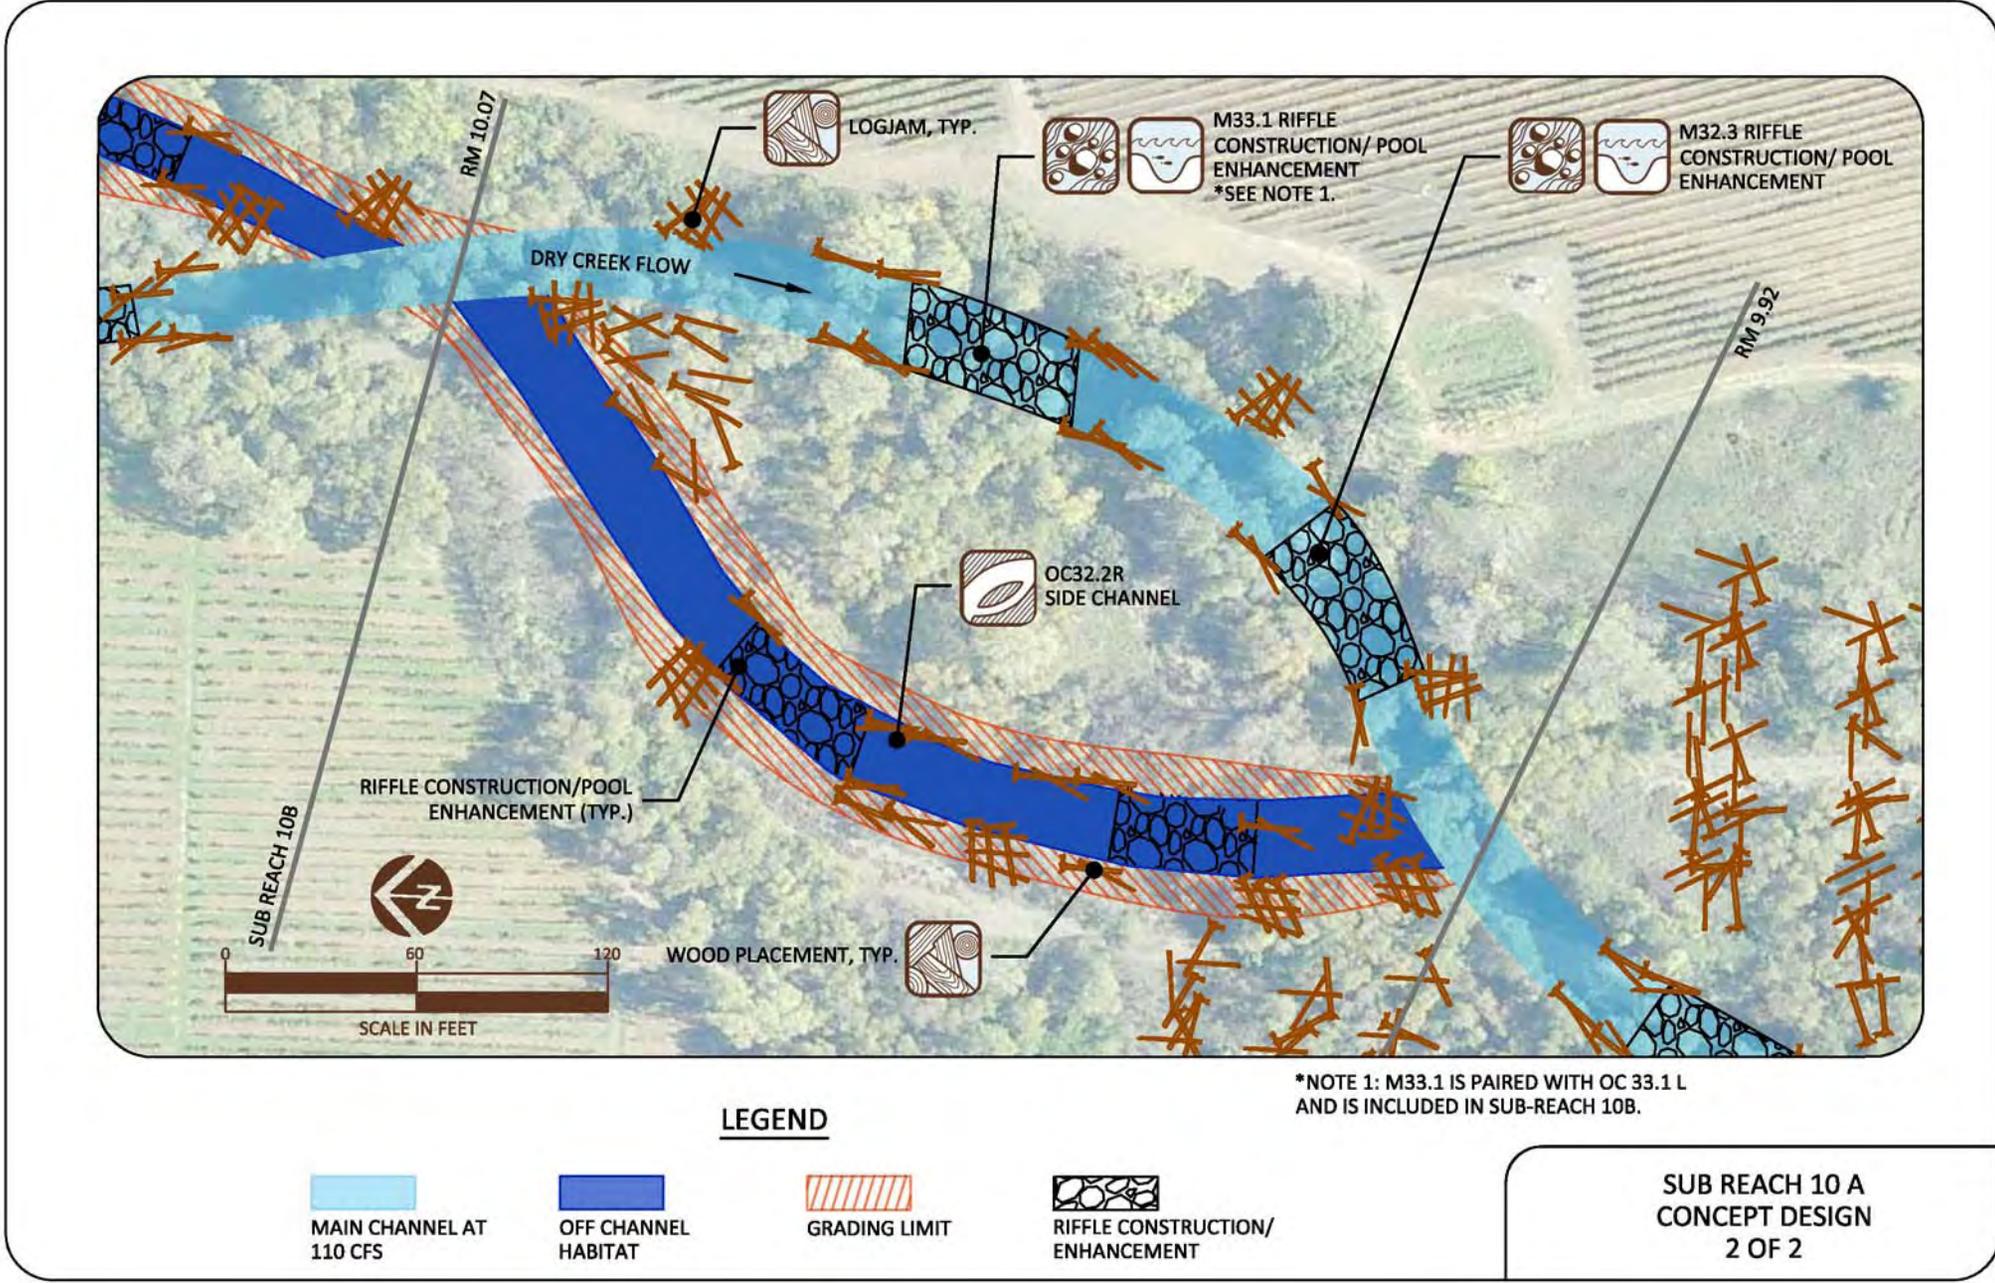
Sub-reach 10a conceptual design detail sheet 2 of 2.
